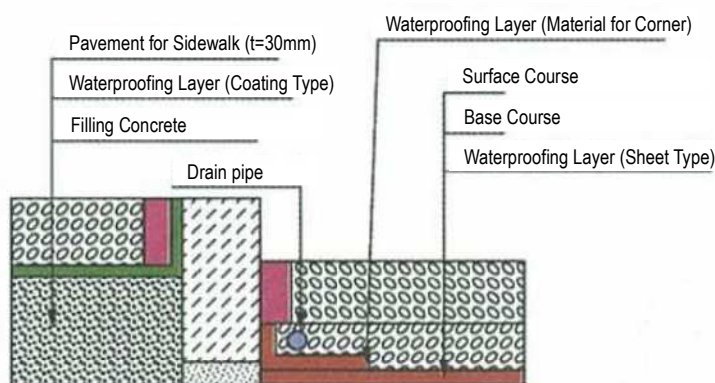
Example of Drainage Structure at the Corner of Curb
